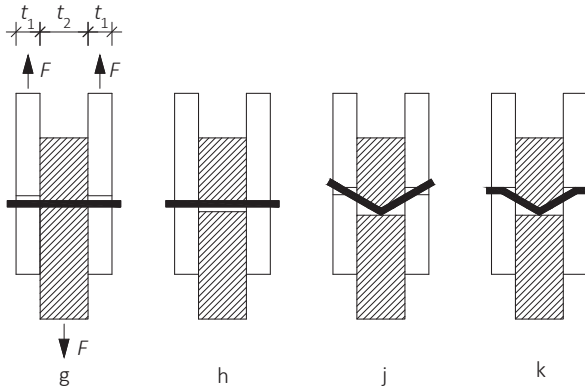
Possible failure modes of timber-to-timer joints with a laterally loaded fastener in double-shear.
